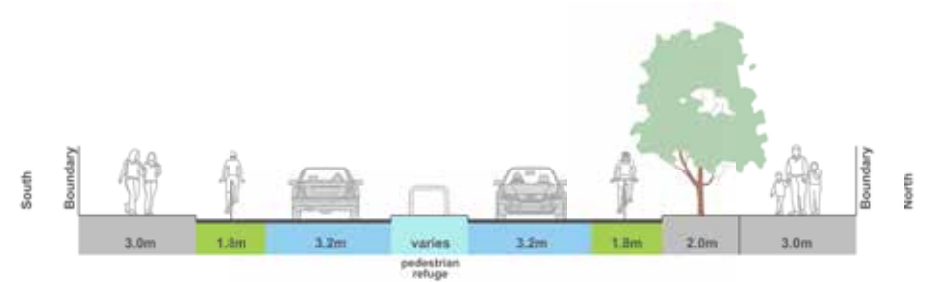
Proposed cross-section of generic pedestrian crossing point along the corridor between the centres. Trees are incorporated into the build-out where possible to emphasise the crossing point.
